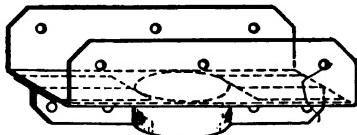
Steel Post-Cap for Cylindrical Pipe-Columns.
